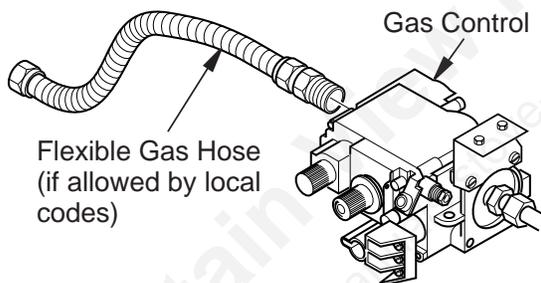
Attaching Flexible Gas Hose to Heater Gas Regulator
